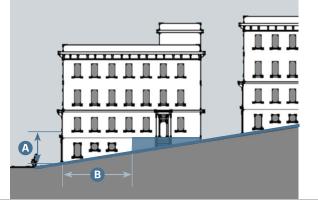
Site Grading for Block-Scale Building Forms
